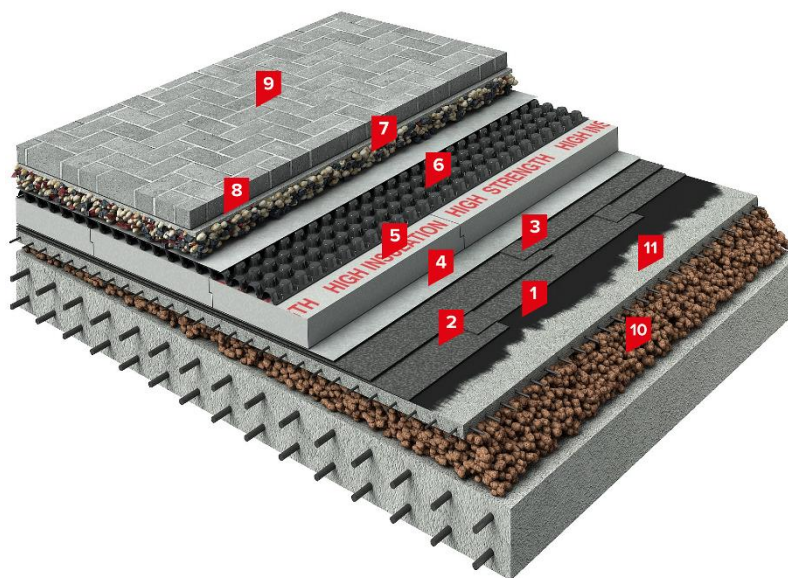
TN-Roof Pavement systems for pedestrian load with drainage layer (TechnoNICOL)
